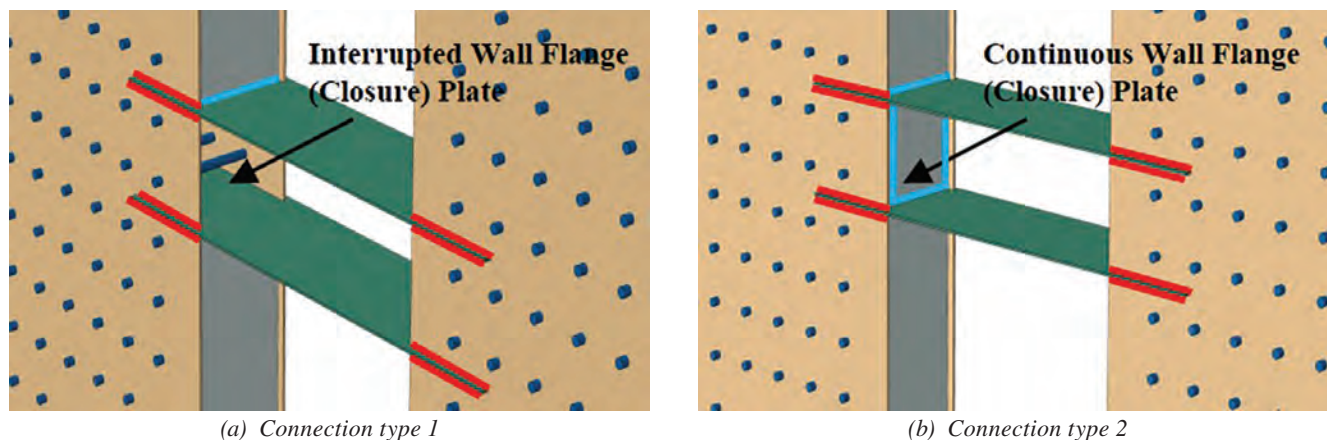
Details of connection type 1 and type 2 (beam web plates are hidden).
